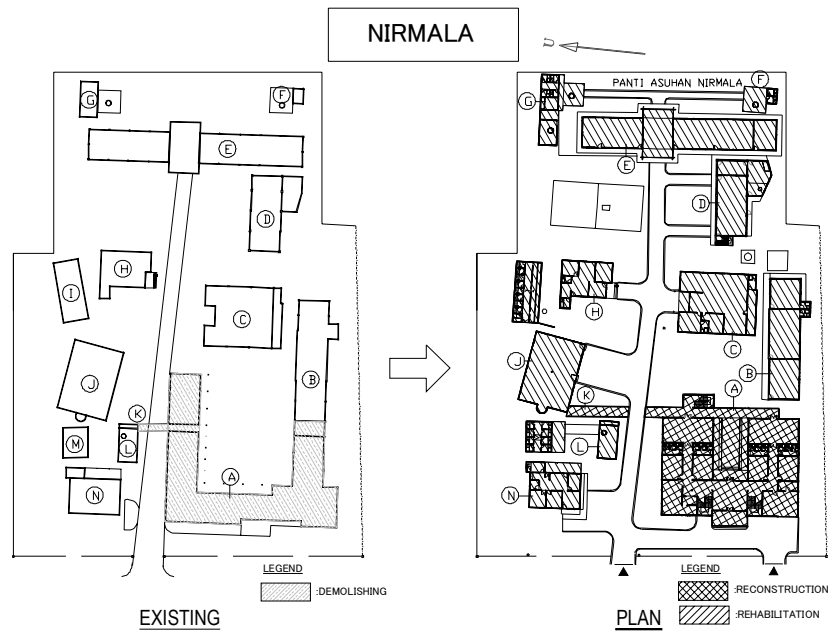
Site Plan and Rehabilitation Plan for Nirmala Orphanage
